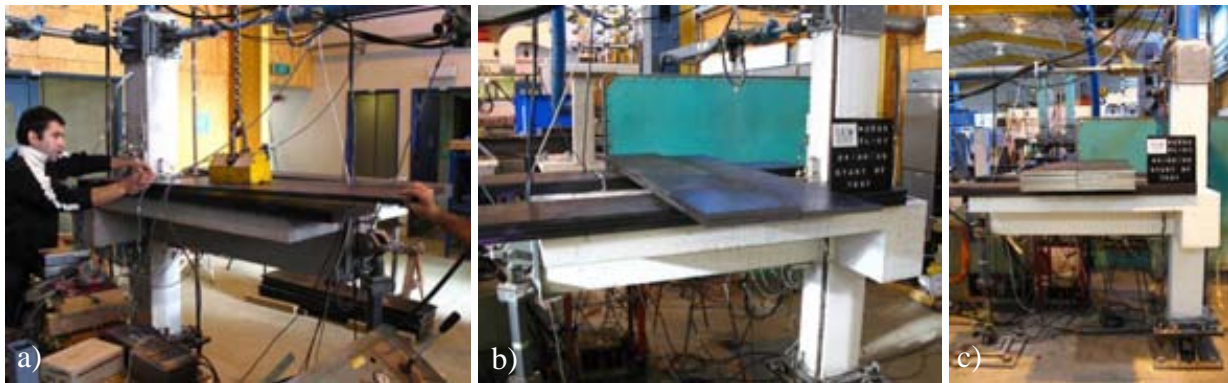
Stages of steel plates loading for gravity-load actions on SL-O1 and SL-R3: a) Parallel steel plates with cantilevered beam; b) total gravity load with cantilevered beam; c) total added steel plates (with pinned beam end) at the start of test.
